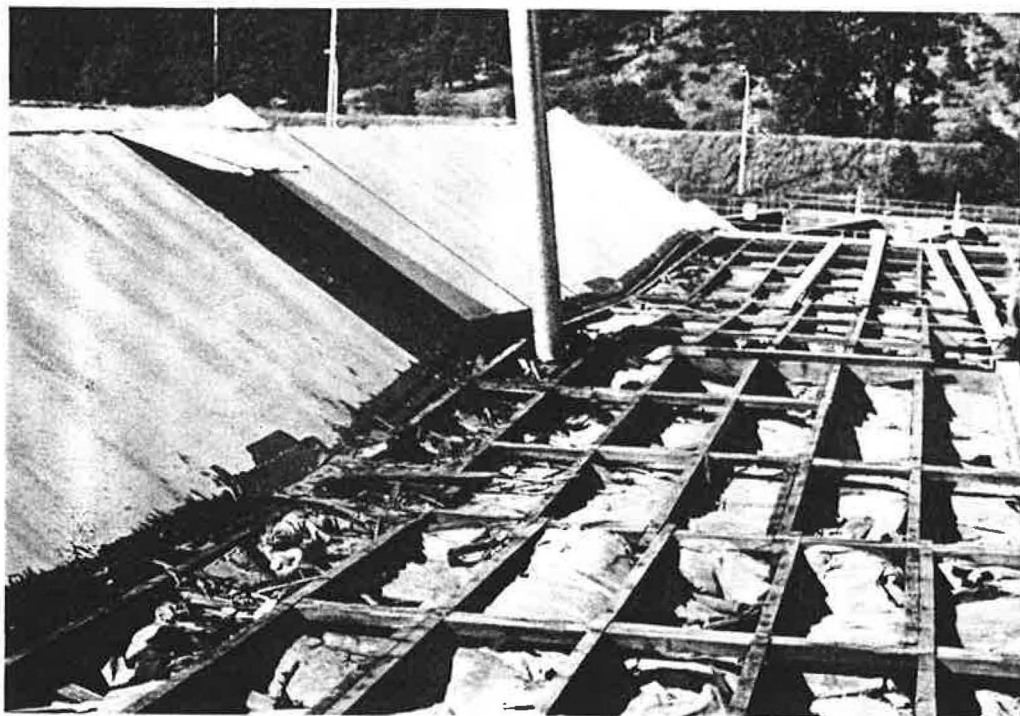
Hatchery building flat roof with outer plywood surface removed.
